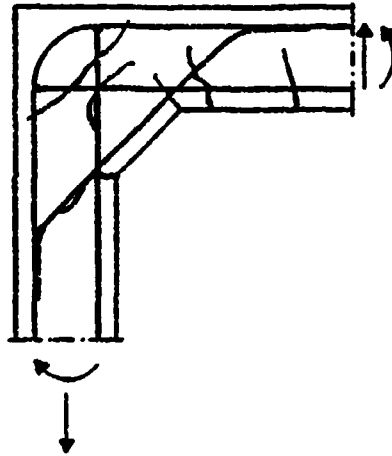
Crack locations at failure on reinforced haunch corner detail. (Balint and Taylor '72)
